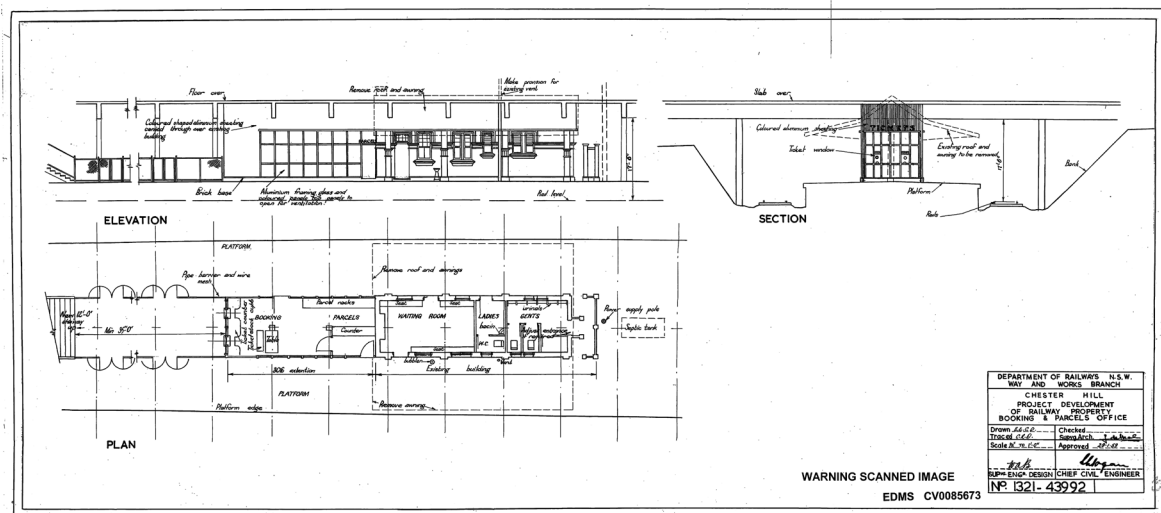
Chester Hill Railway Station bookings and parcels office, c.1959 (Virtual Plan Room).
